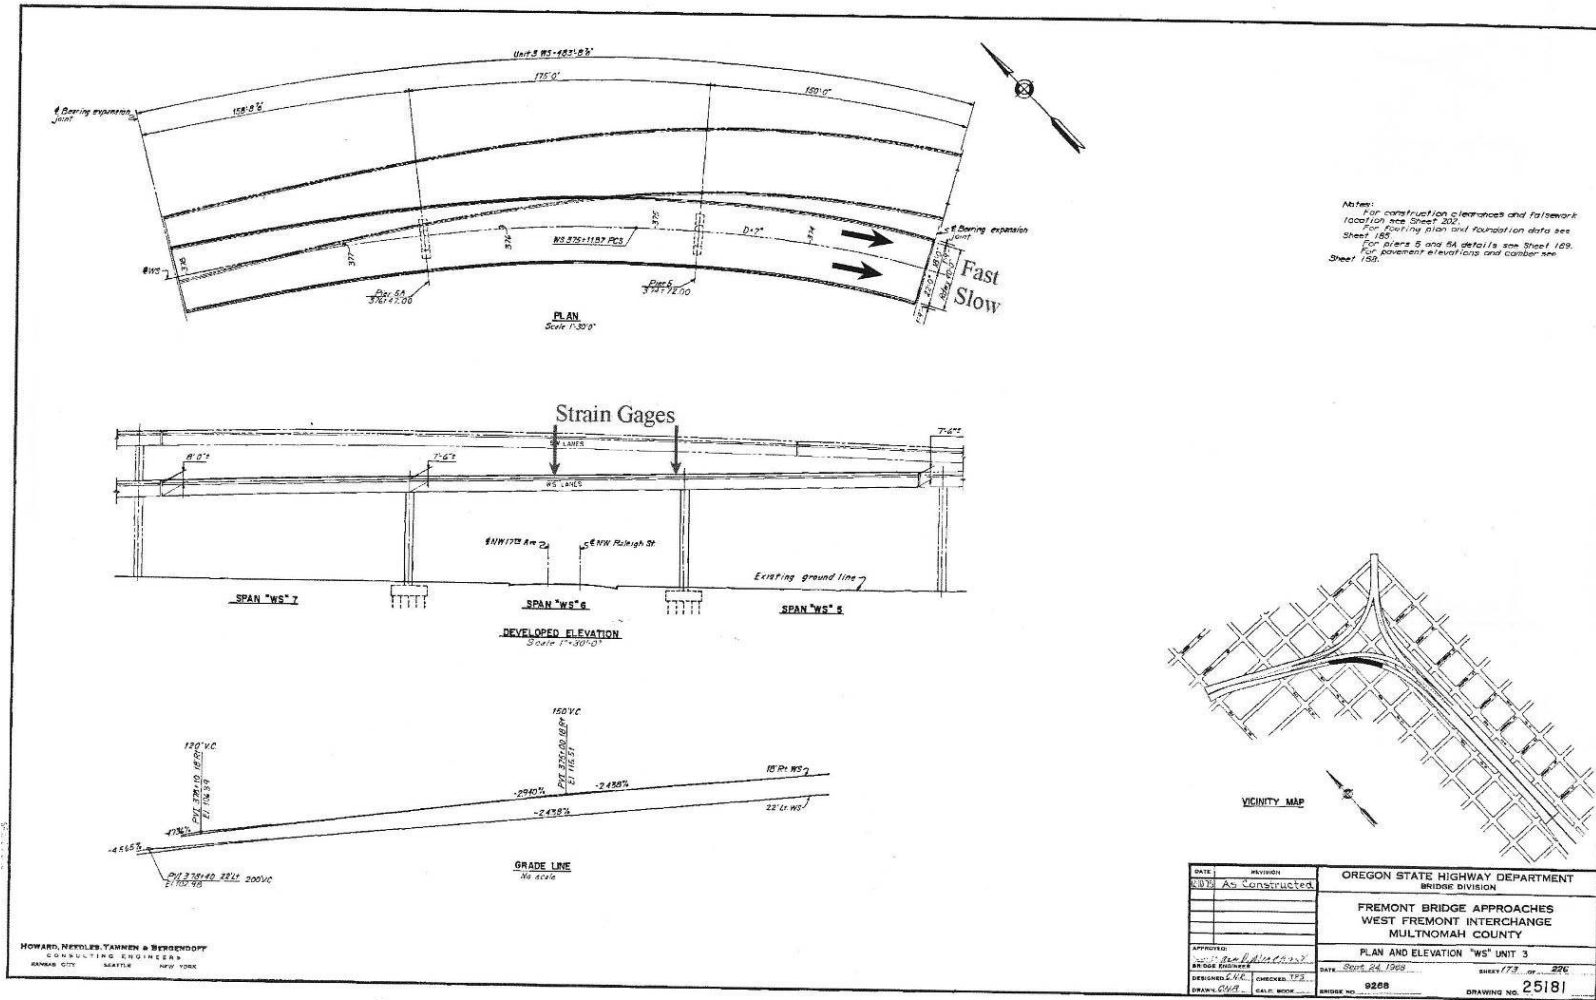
Instrumented sections for Bridge superstructure 09268B (WS line).
